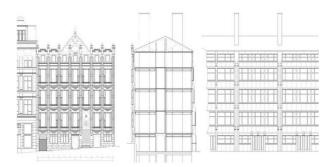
Elevation and Building Section, Oriel Chambers. Source: Façades Confidential.
